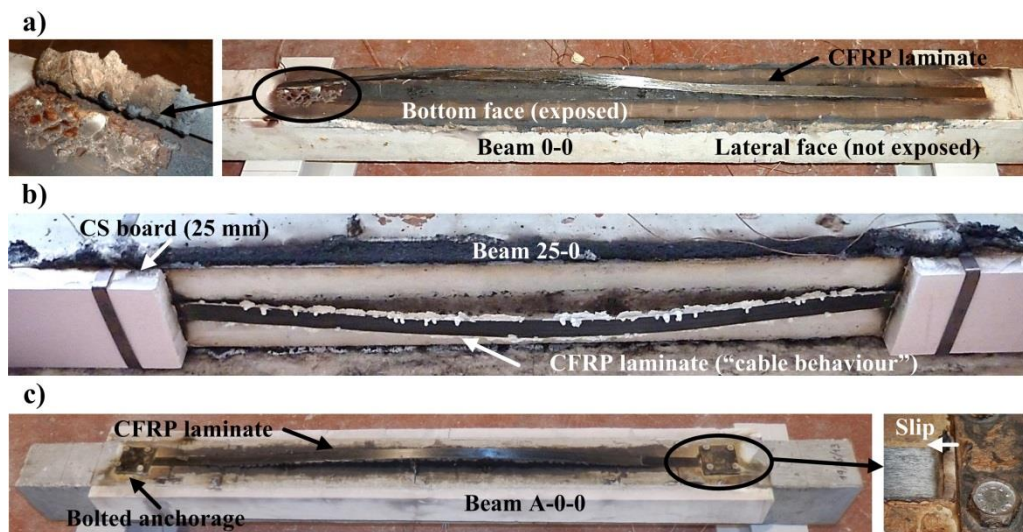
Examples of the failure modes of the CFRP strengthening system: a) beam 0-0; b) beam 25-0; c) beam A-0-0.
